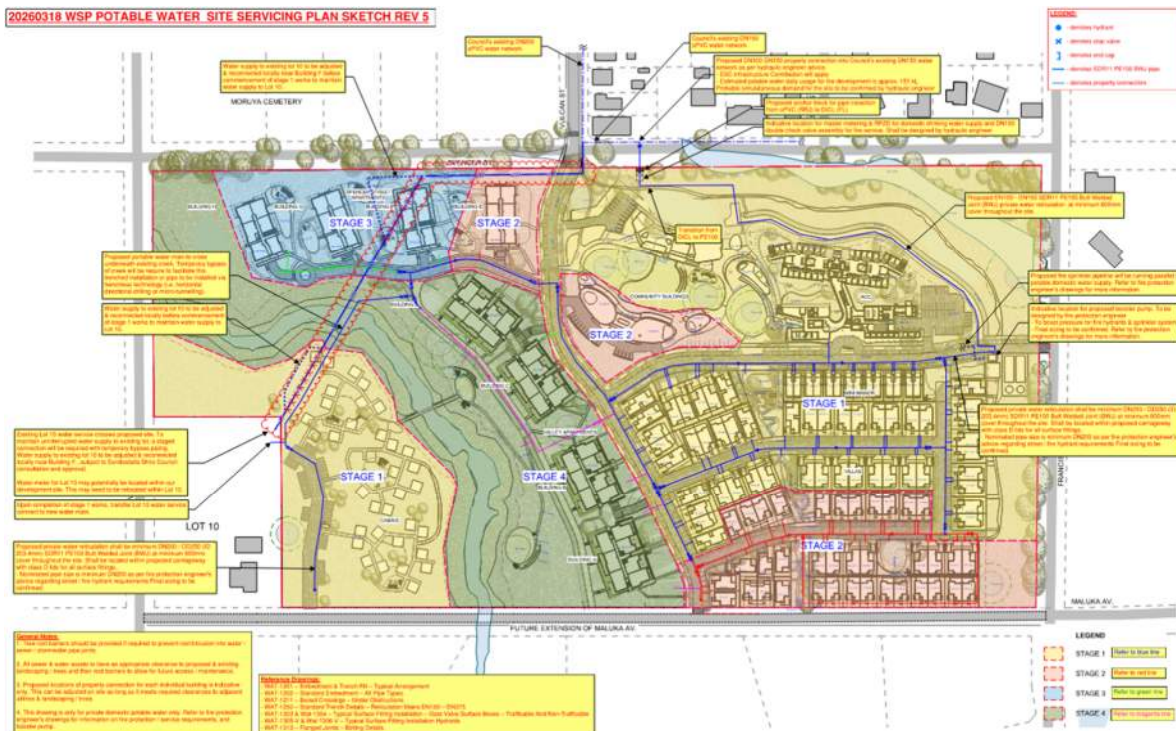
Potable Water Infrastructure Concept Design Site Plan
